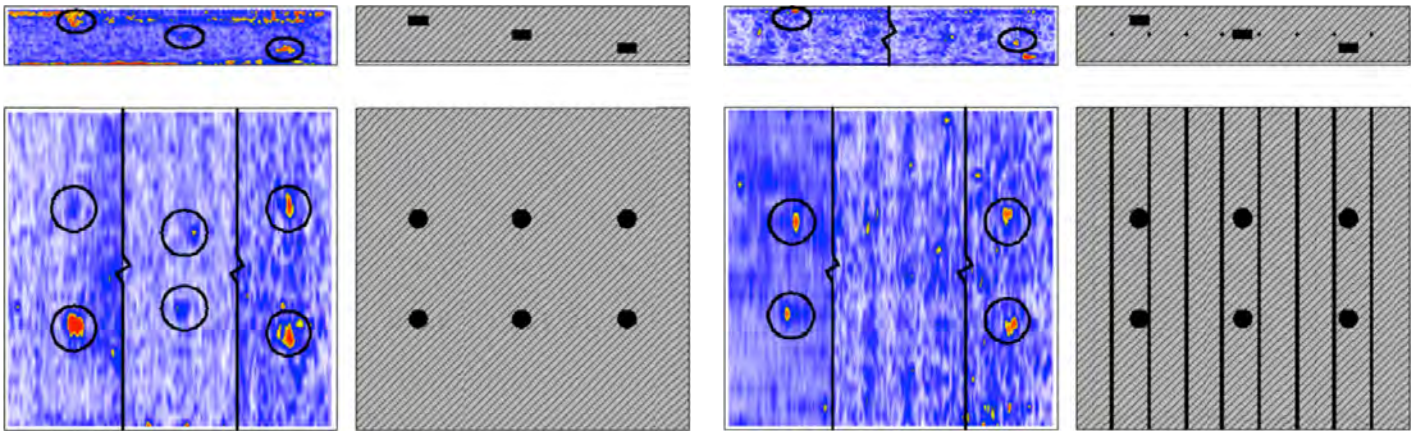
Medium clay lump slabs without reinforcement (left) and with reinforcement (right).
